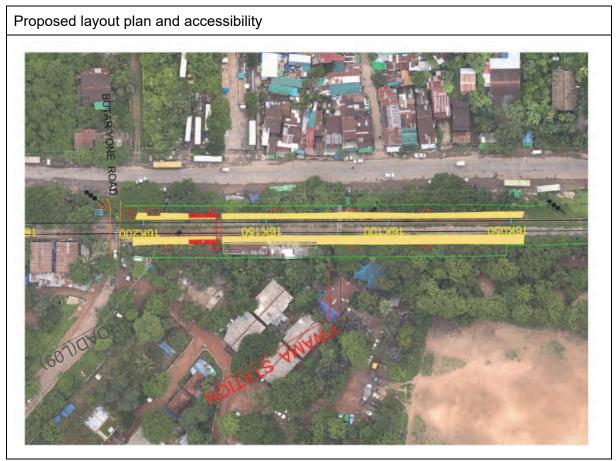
Proposed Layout Plan and Accessibility (Gyogon Station)
